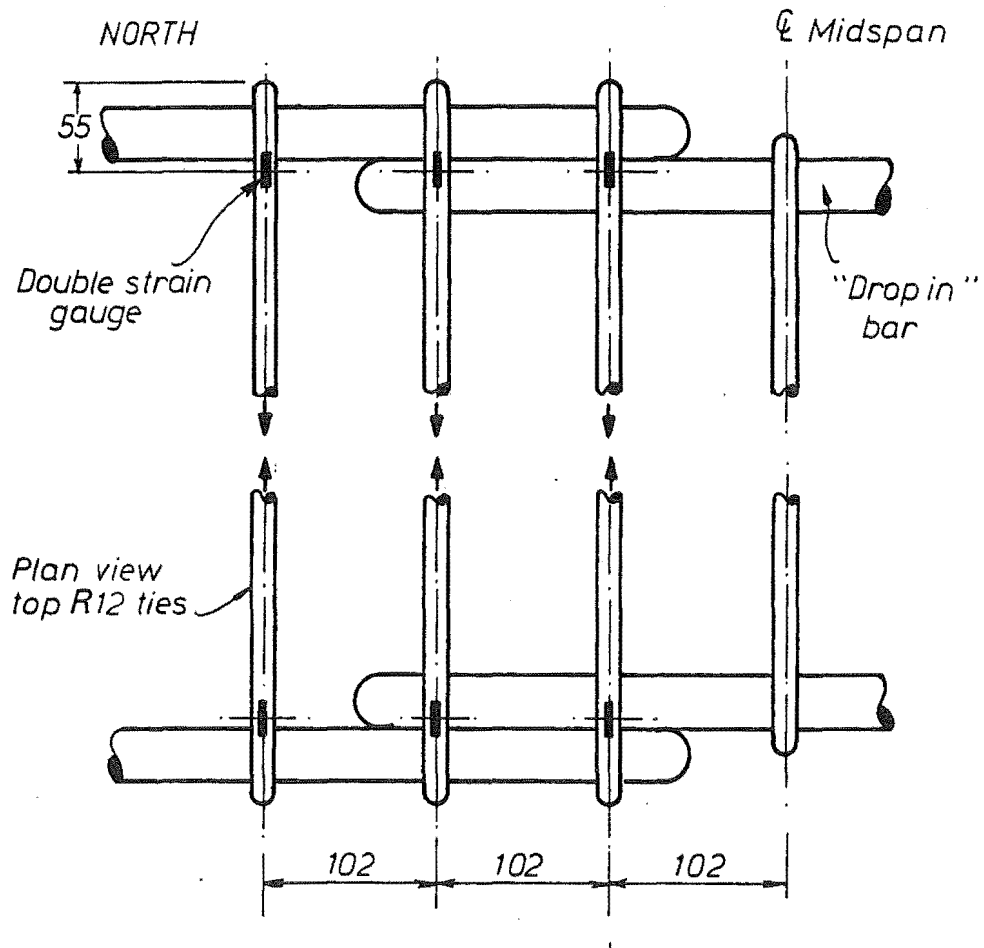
Stresses in the Horizontal Transverse Reinforcement at Midspan - Top North Stirrups of Unit 2.
